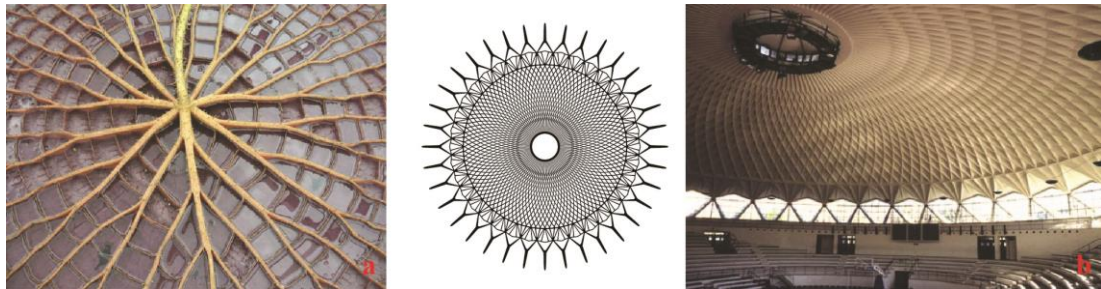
a) Amazon water lily, b) Plan and view from Palazzetto dello Sport in Rome by Pier Luigi Nervi (Sources: a) <https://asknature.org/strategy/leaves-given-structural-support/>, b) www.pinterest.com, c) <https://arqteoria.wordpress.com/2013/09/23/aula-2-expressionismo-estrutural/>. Retrieved at: 25.12.2017)
